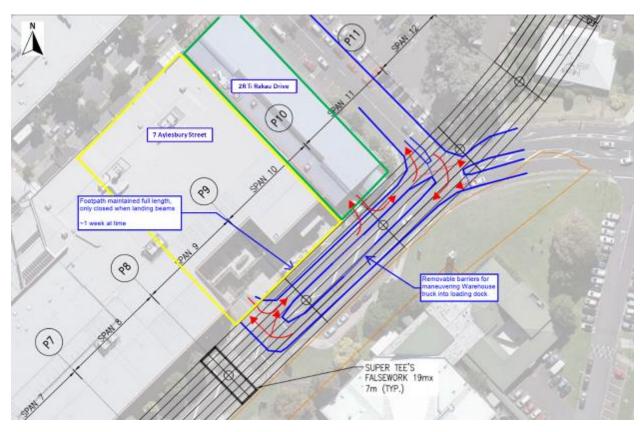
7 Aylesbury St and 2R Ti Rakau Dr temporary access during construction
